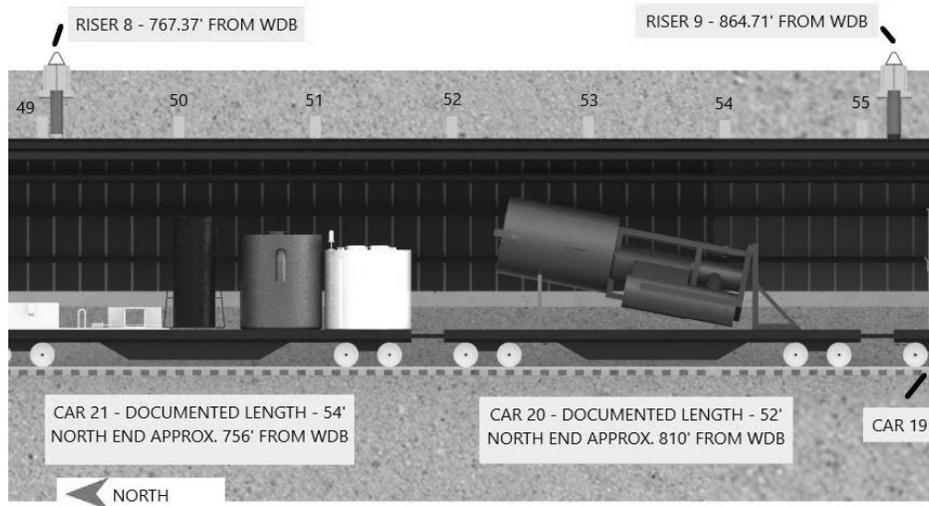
Riser 8 to Riser 9 Tunnel Section.
